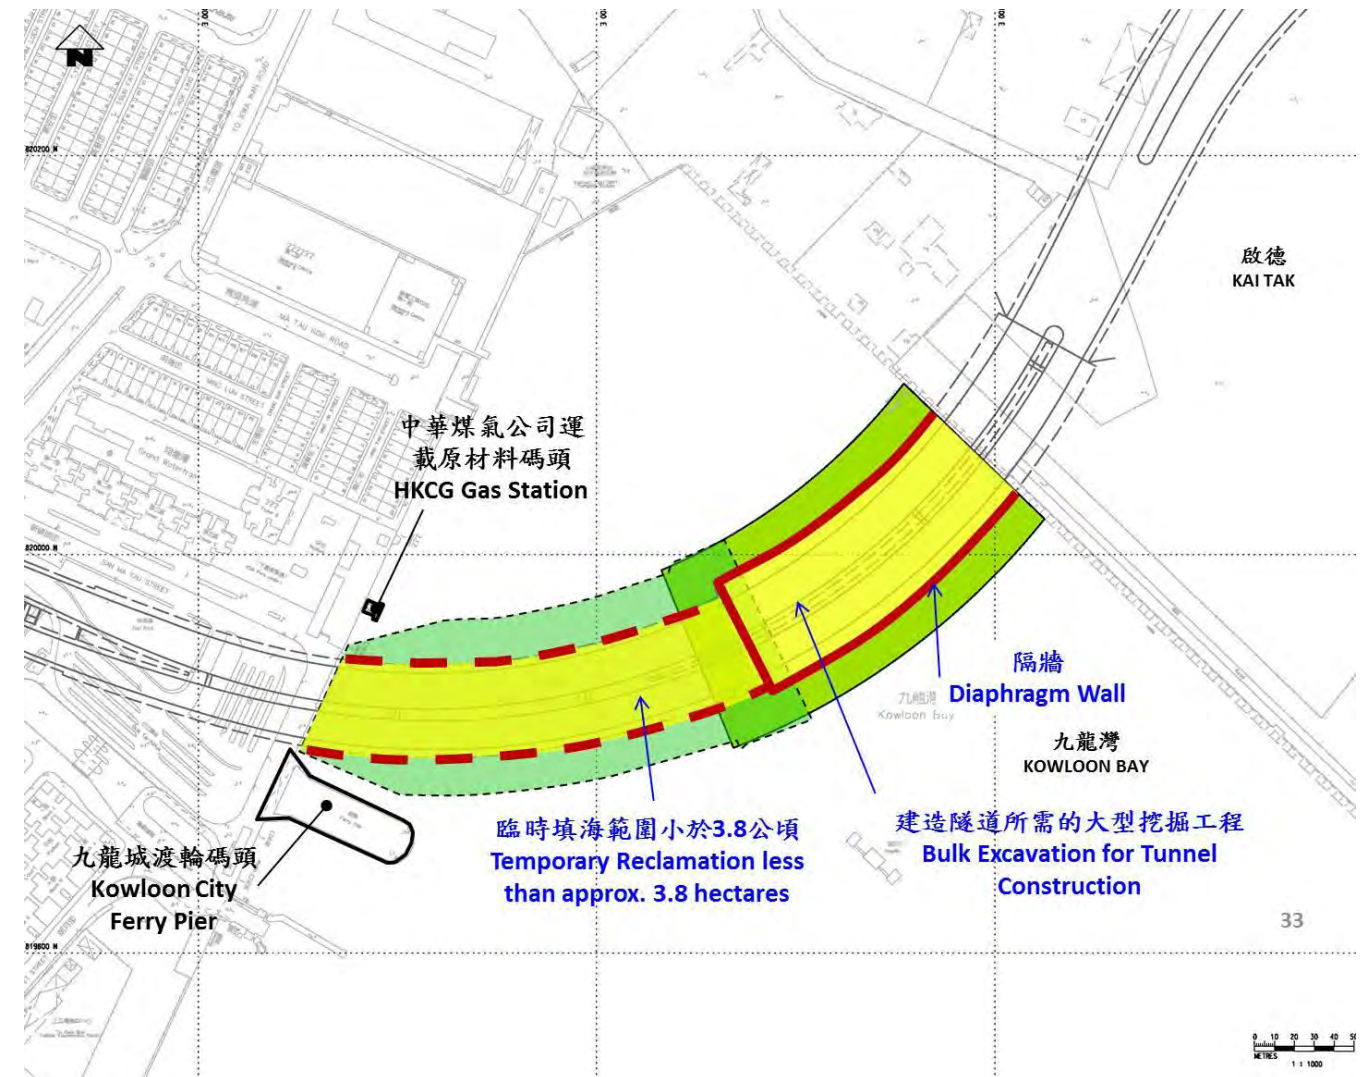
Two Stage Temporary Reclamation Arrangement in Kowloon Bay
